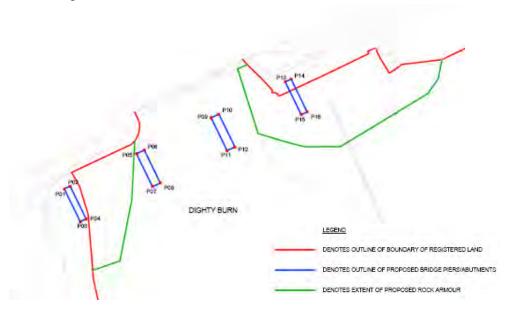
Proposed Dighty Burn Bridge: Footings and Rock Armour Modifications,
